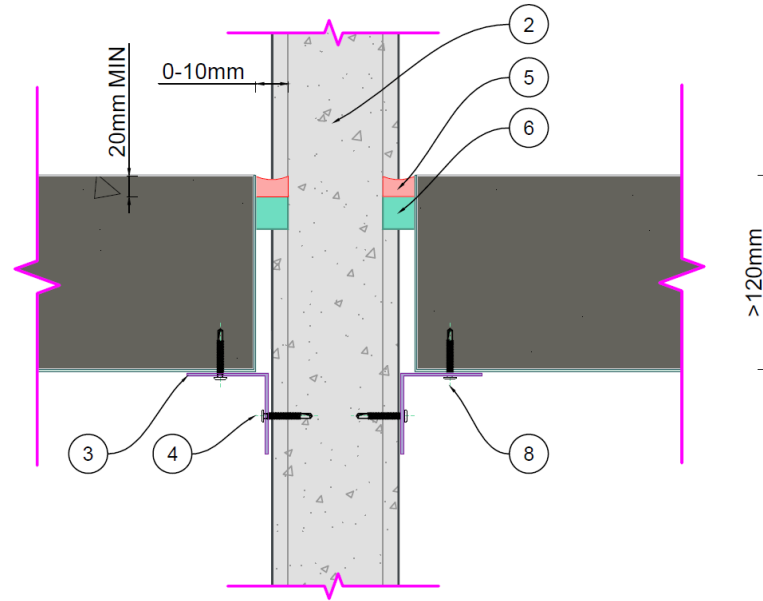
Wall-to-stair Joint (0-10 mm gap)
